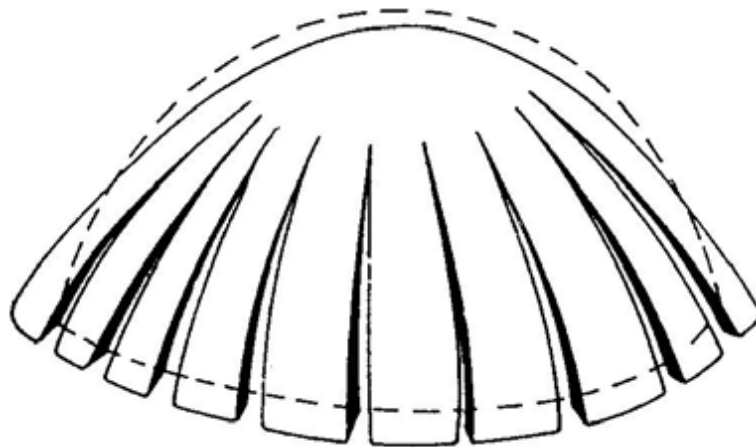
Out of plane mechanism in masonry structures (D’Ayala et al., 2002).
